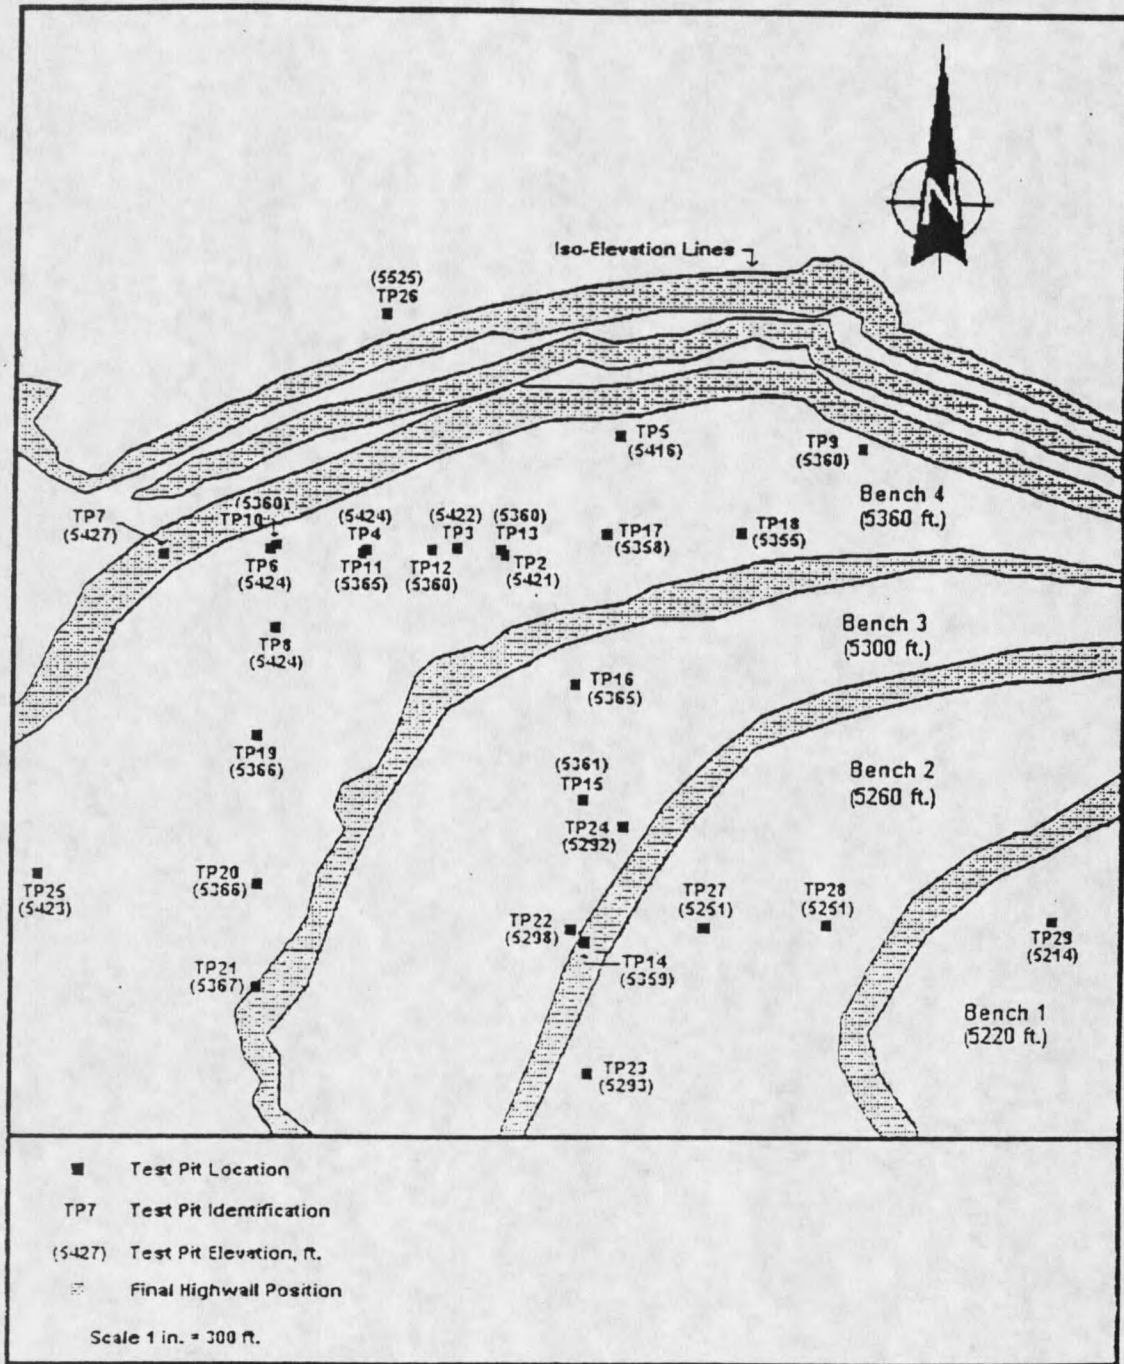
Overhead view of waste rock repository with test pit locations and elevations.
